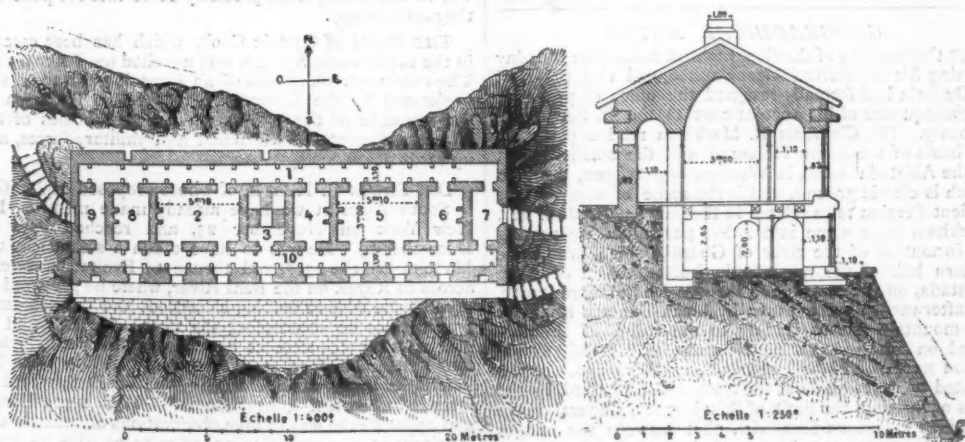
Plan and section of the New Observatory. Plan of the first floor:—1, Passage, magazine; 2, Salon; 3, Staircase; 4, Dining-room; 5, Work room; 6, Guest-chamber; 7, Telegraph; 8 and 9, Bed-rooms. The ground-floor will be used for provisions.
